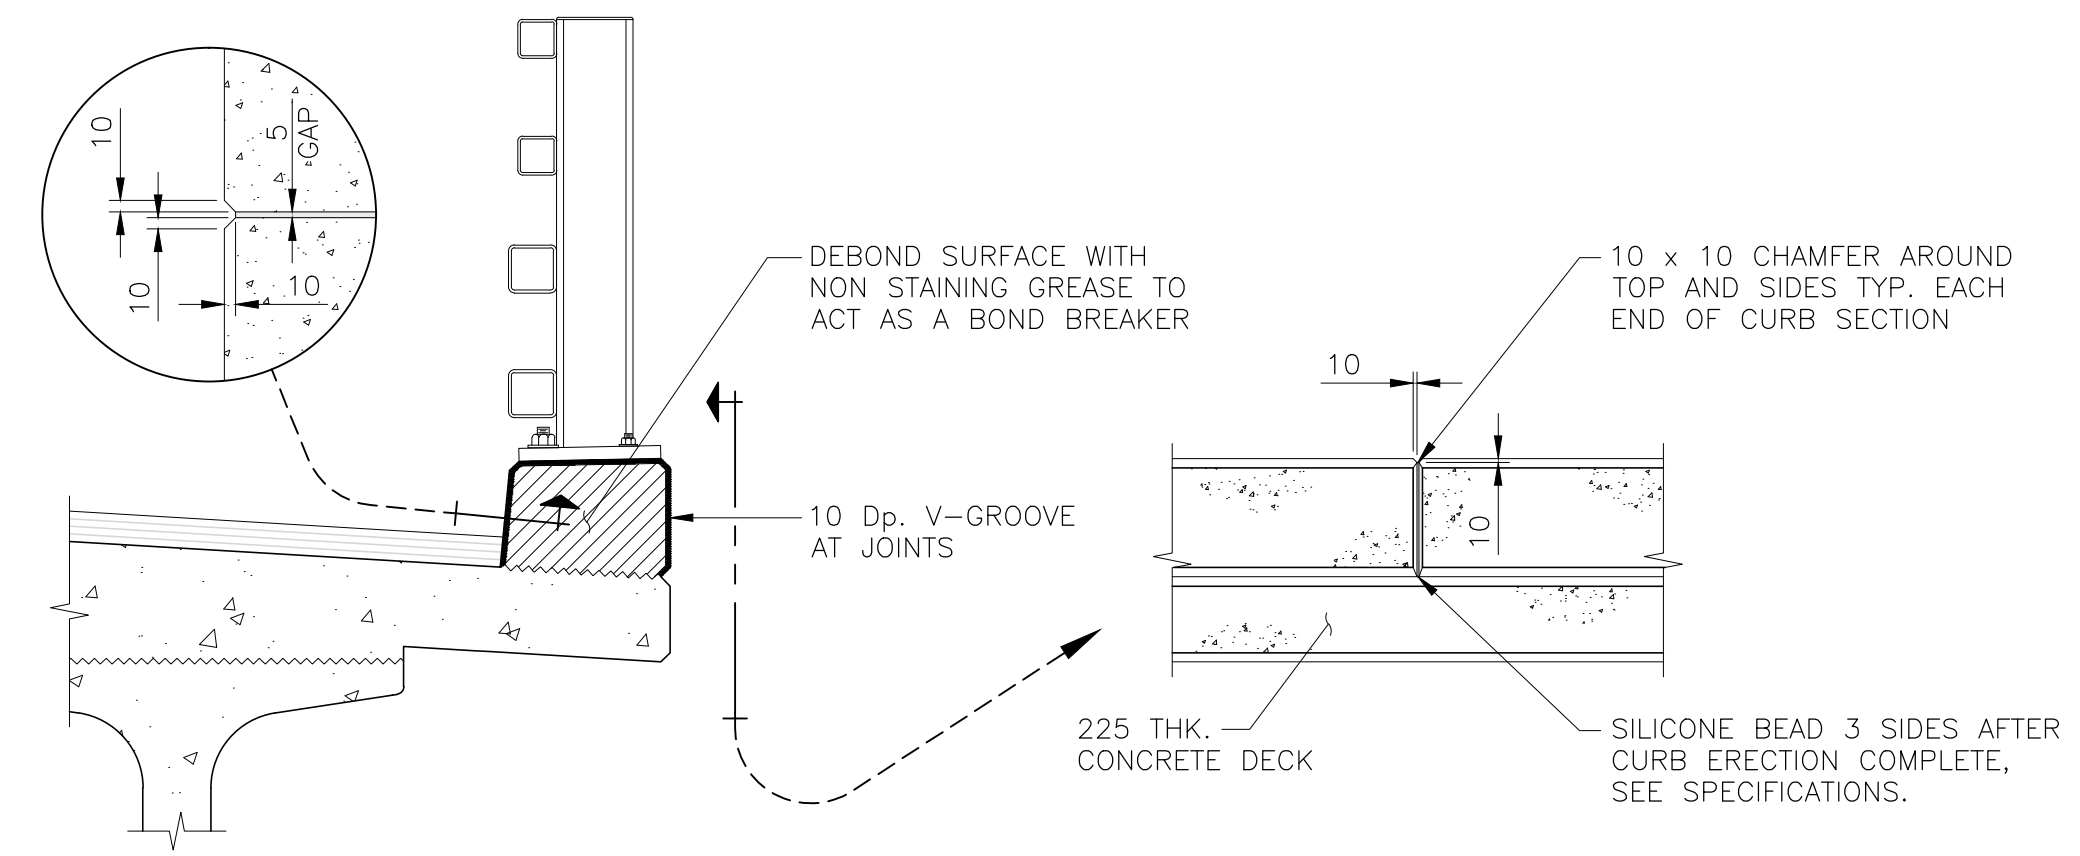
DETAIL - TYPICAL TRAFFIC BARRIER (3 S5)
